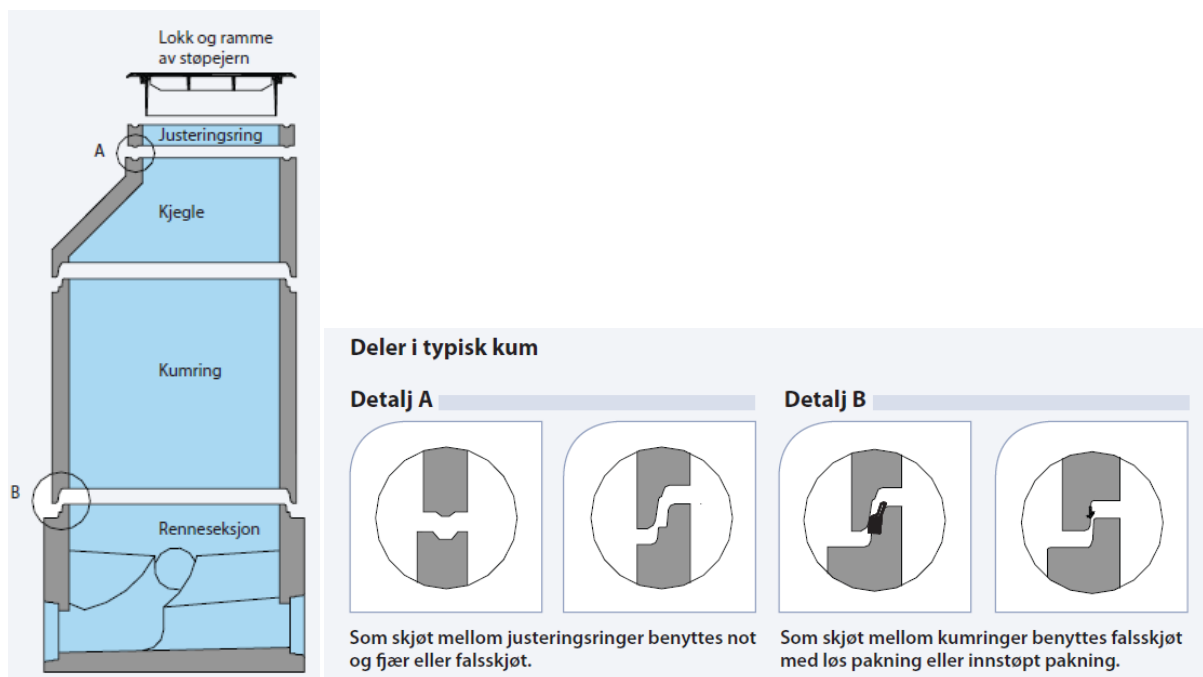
Manhole principal similar to the manholes at Risvollan (rubber joints, detail B) (Basal, 2011)
